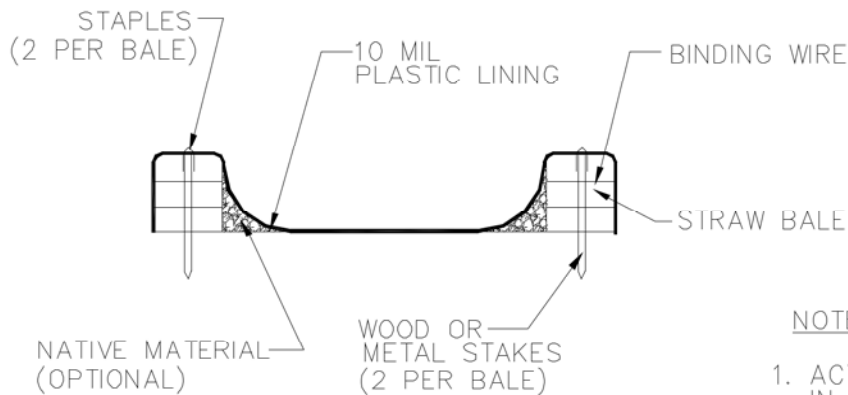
EXHIBIT "C" (Stormwater Pollution Prevention Plan)
